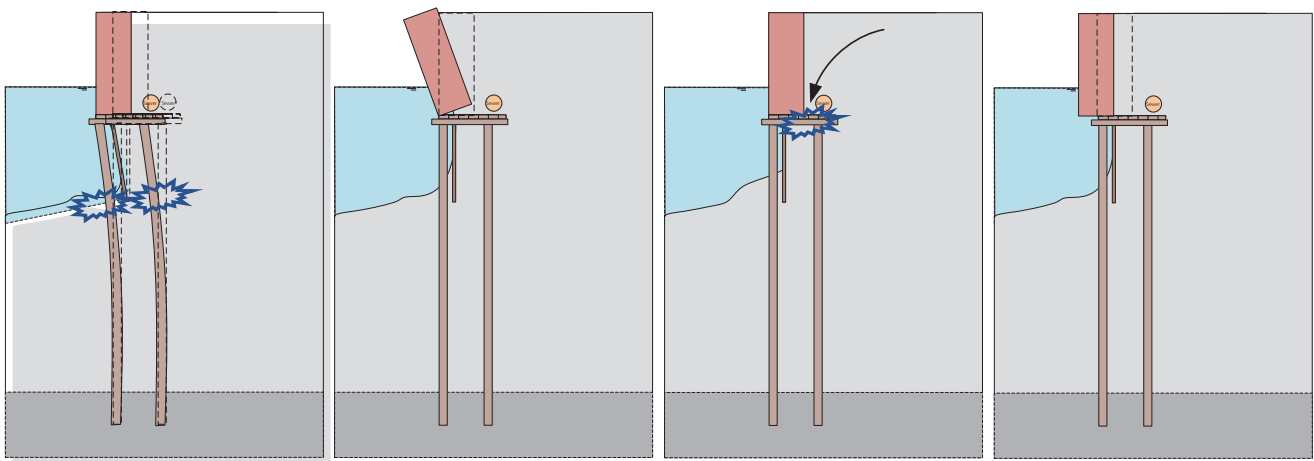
Most relevant failure mechanisms for the quay wall from left to right: horizontal bending of the piles and local geotechnical failure of soil around the piles, overturning of the masonry wall, cross-beam failure and horizontal sliding of the masonry from the deck
